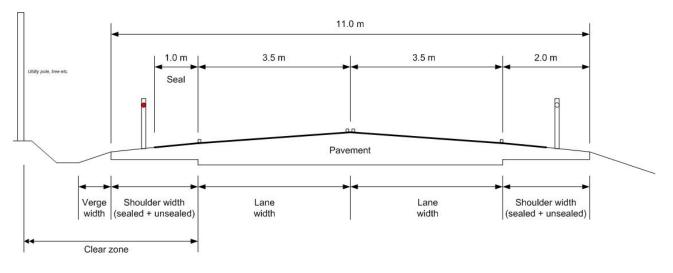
Recommended design (desirable) cross-section for Ulan Road
